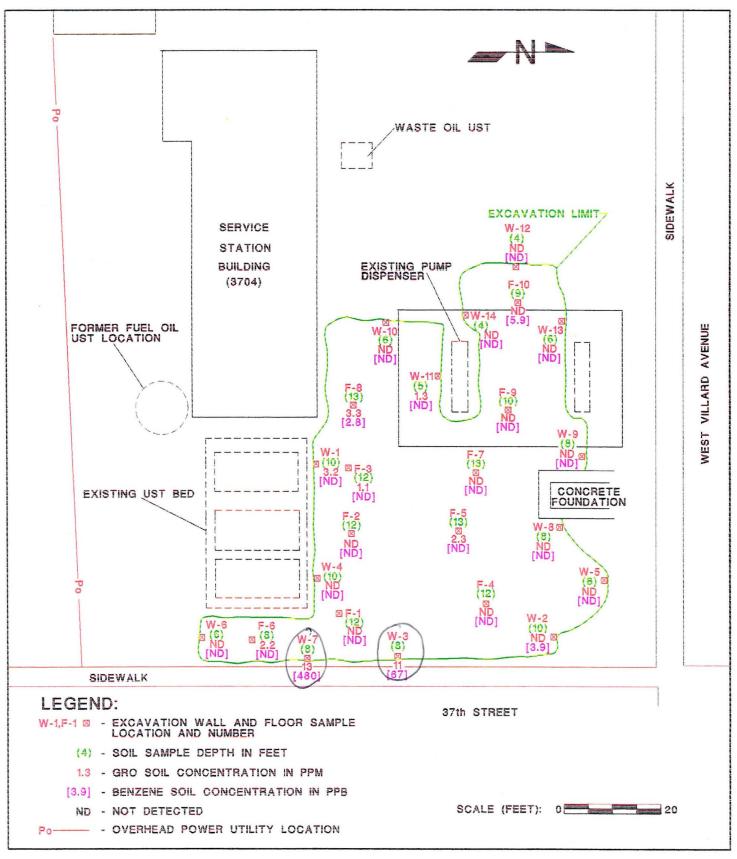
EXTENT OF EXCAVATION AND FLOOR/WALL SAMPLE RESULTS
